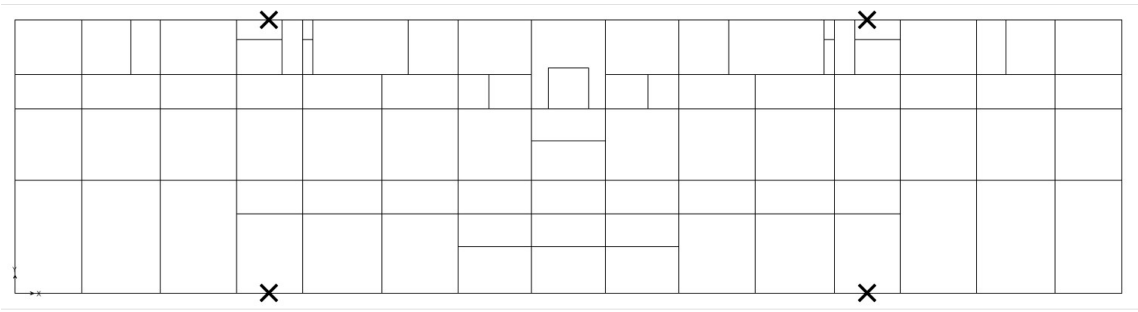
Damper Placement at 4th floor (R-X); ODAM: 4 dampers
